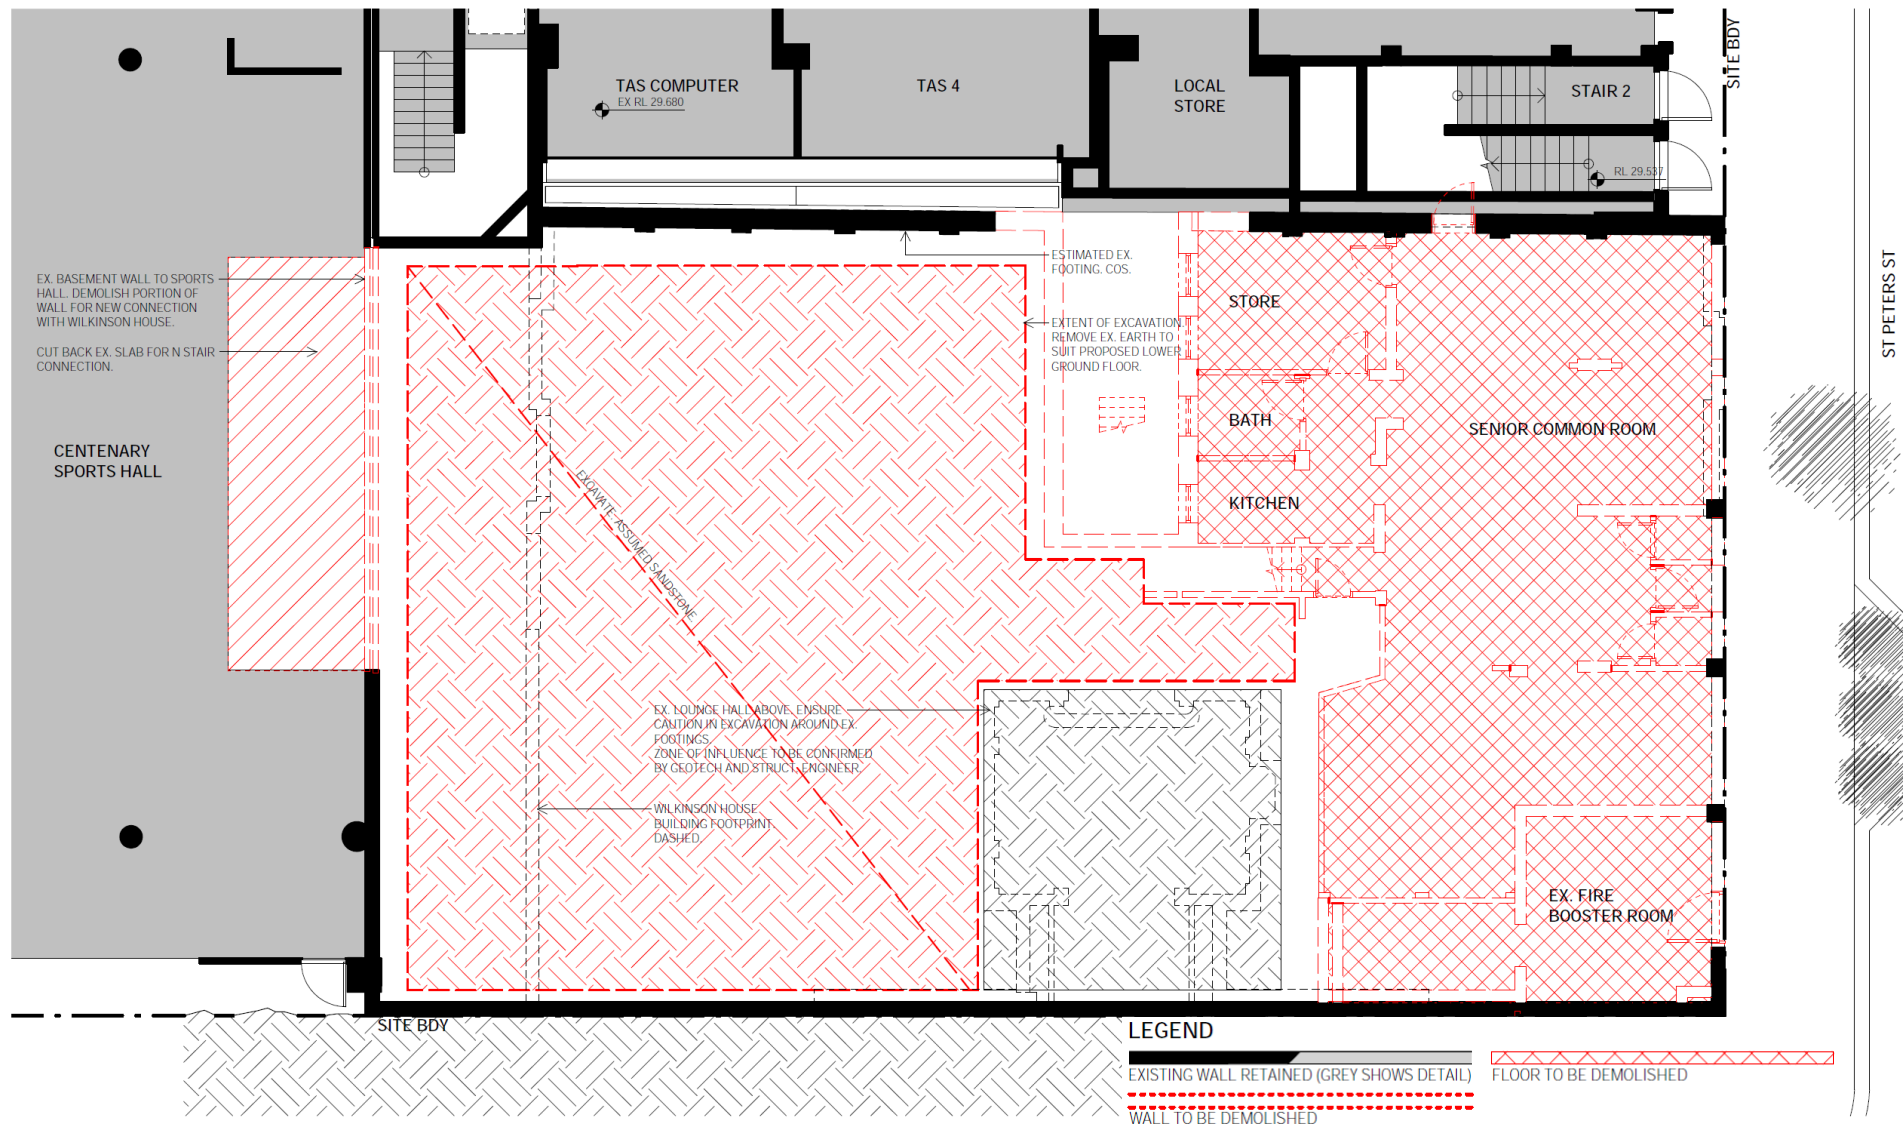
Lower ground demolition plan with excavation footprint indicated.
